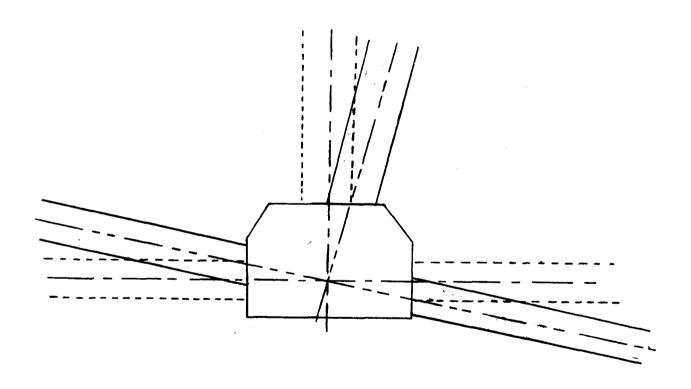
Fixed Truss - Joint Unloaded and Loaded
